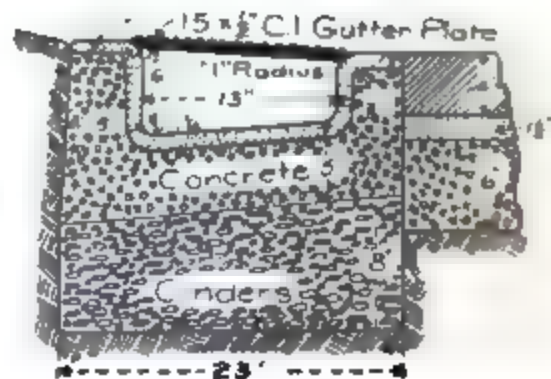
GUTTER FOR ELEVATED BRICK CROSSING WITH CONCRETE FALSE CURB.
